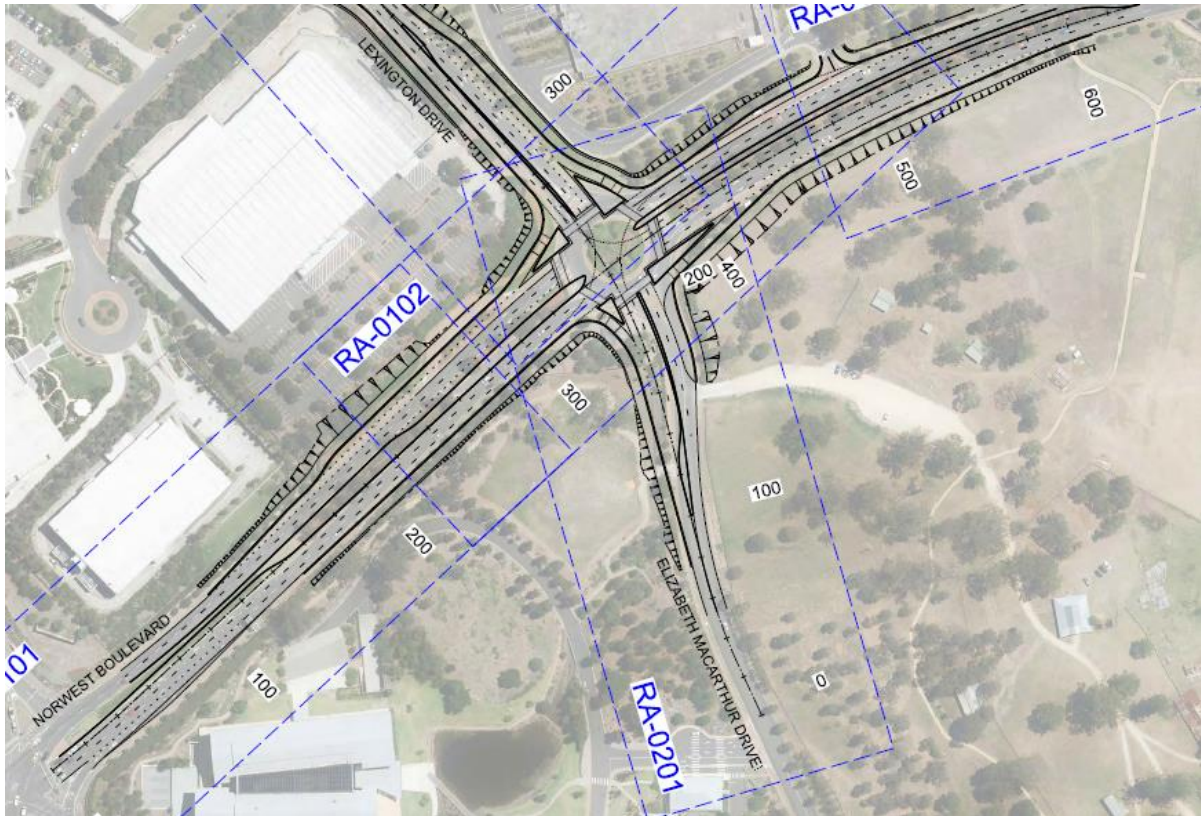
Traffic Signal Upgrade at Norwest Boulevard / Lexington Drive Intersection (Option 2)
